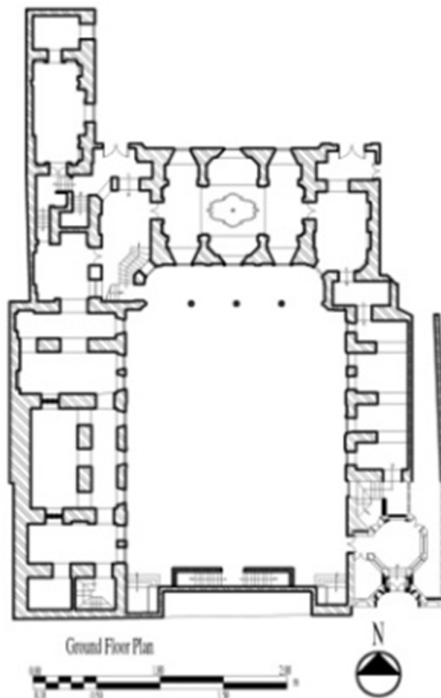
Plan of a house with central yard in Tabriz, which is built in u-shape.
